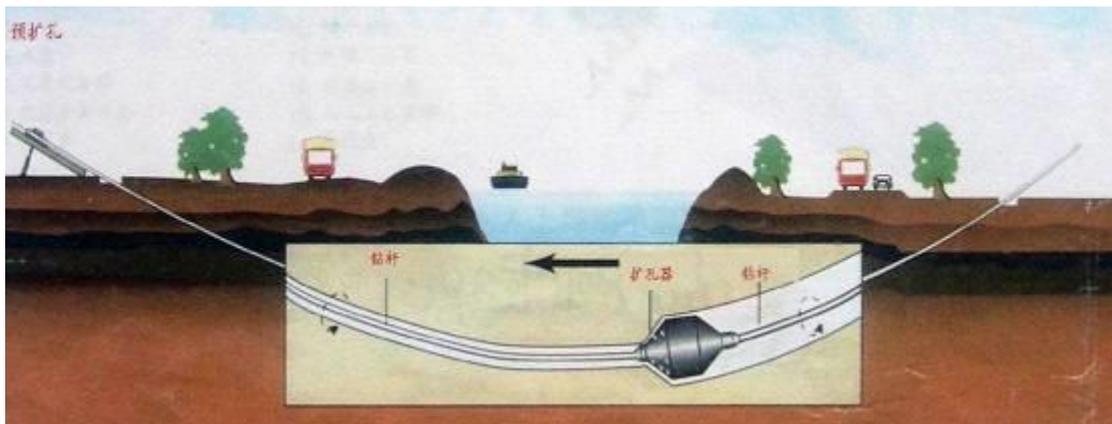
Sectional diagram of pre-expanded hole in directional drilling construction
